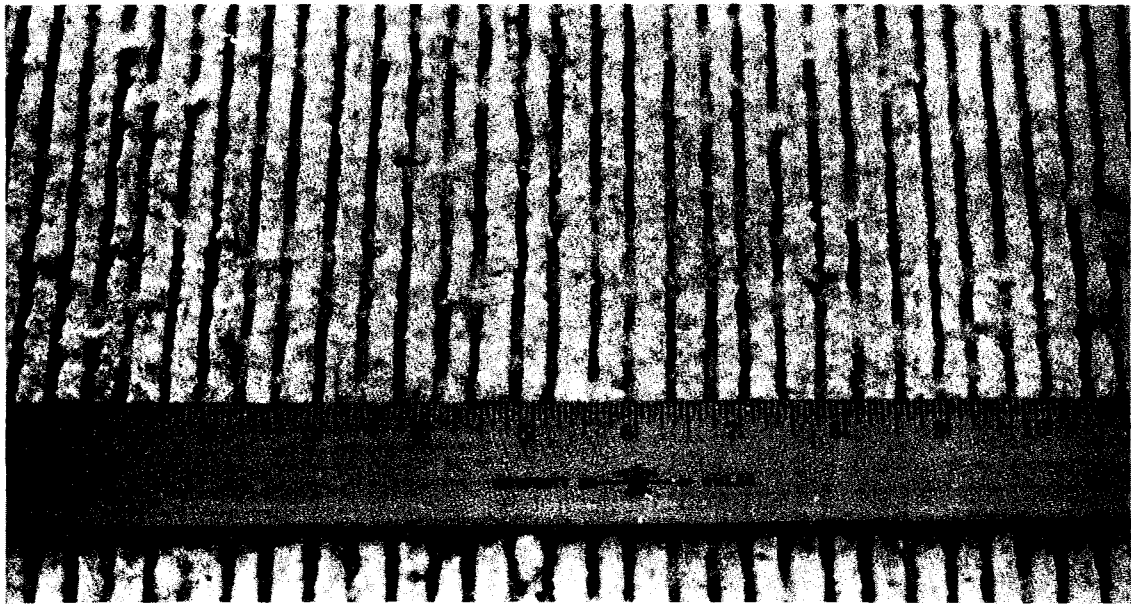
Test Section F-12: Burlap + 1/2 in.
